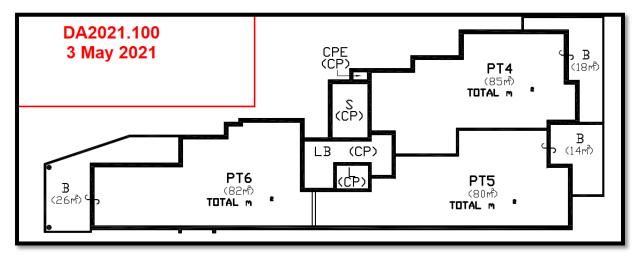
Extract of the proposed first floor strata subdivision, dated 21/04/2021.
